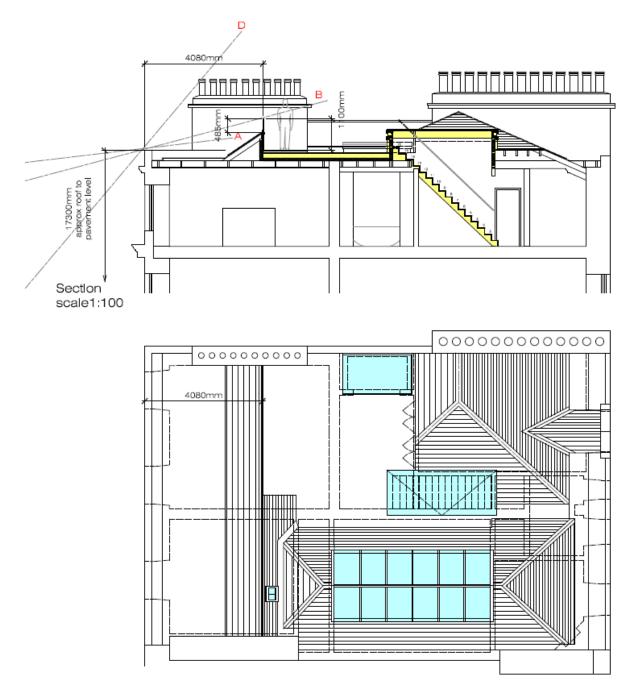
Proposed Roof Plan and Sections outlining distance from façade.
